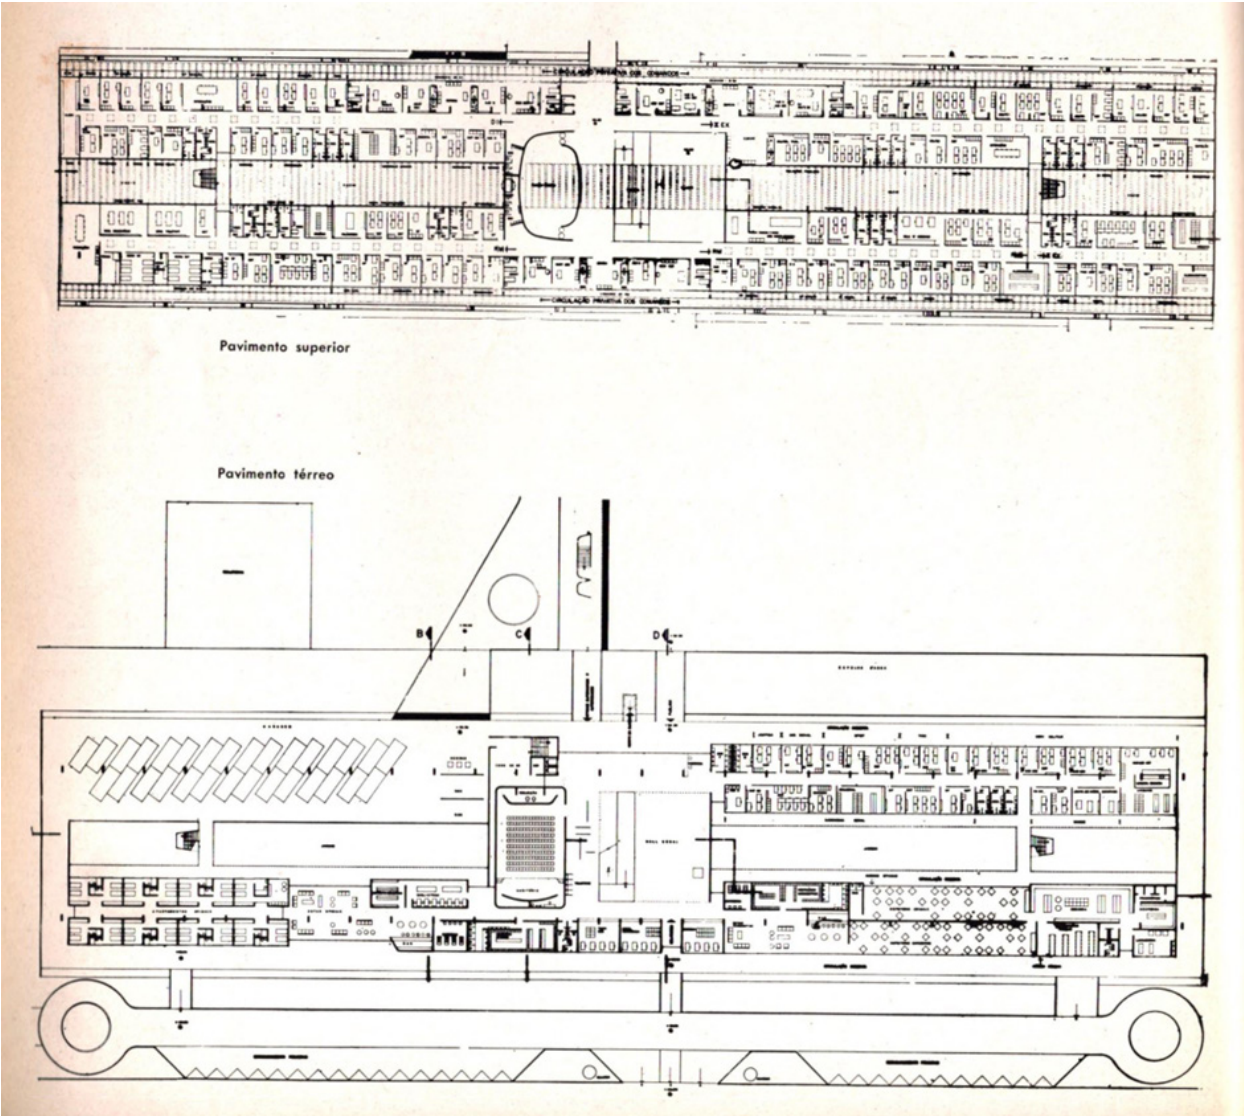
HQ main building floor plans: upper floor and lower level. Source: Revista Acrópolis 321, 1965
